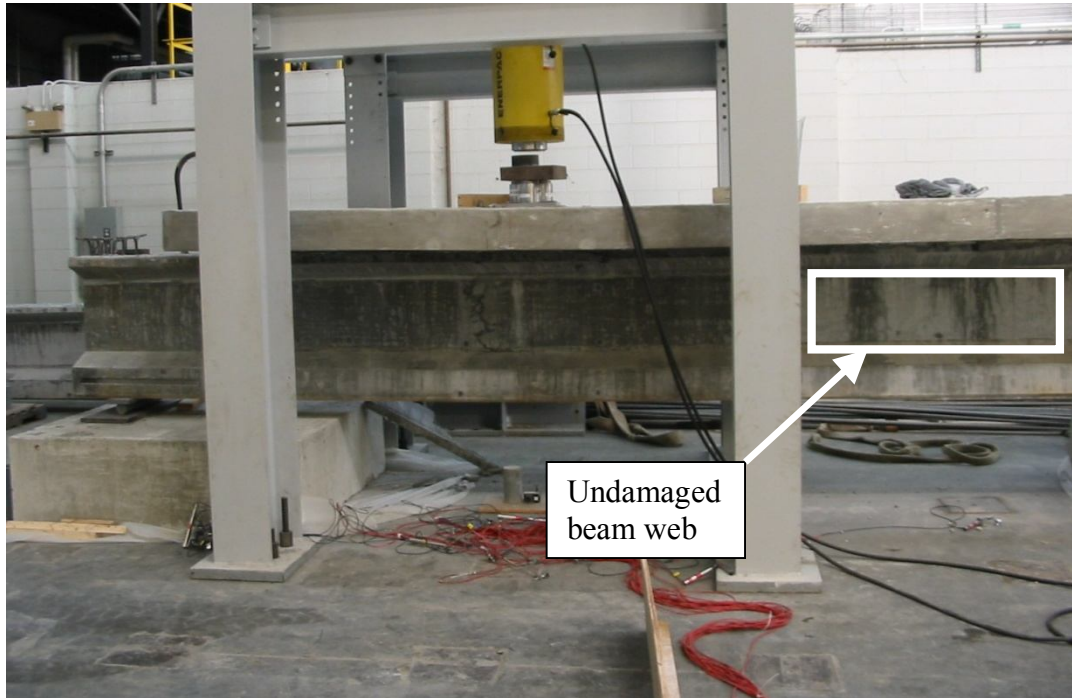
Girder 2 during shear testing. The undamaged portion at right was cut out for use in fiber alignment study.
